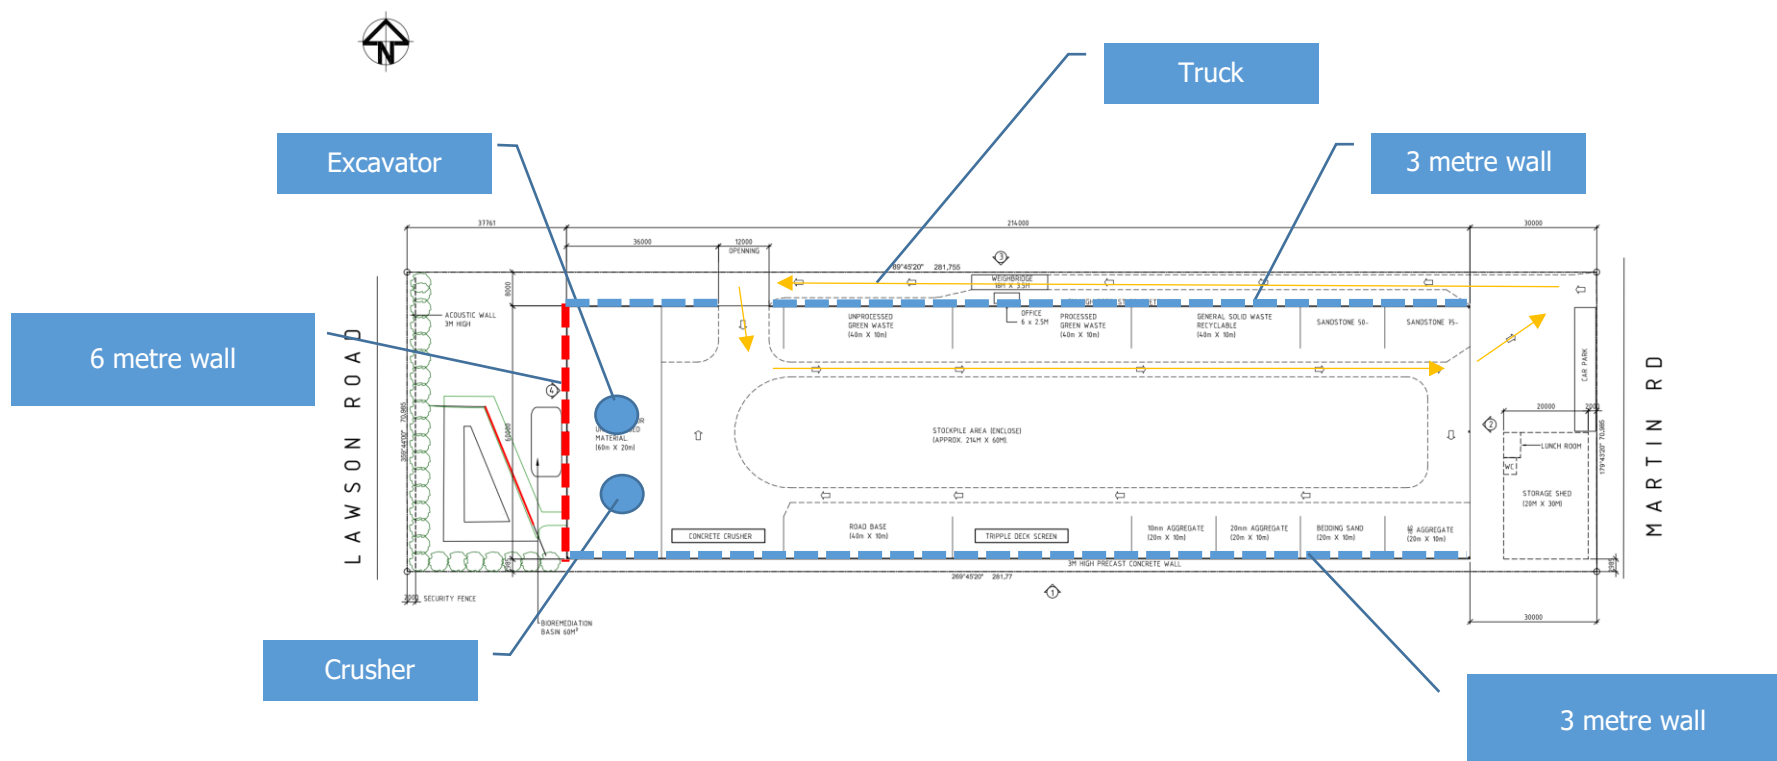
Site Plan showing Barriers & Source Locations – Scenario 2
